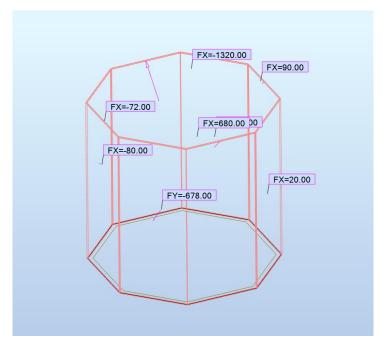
Robot Model of the Truss Connection with Applied Forces
